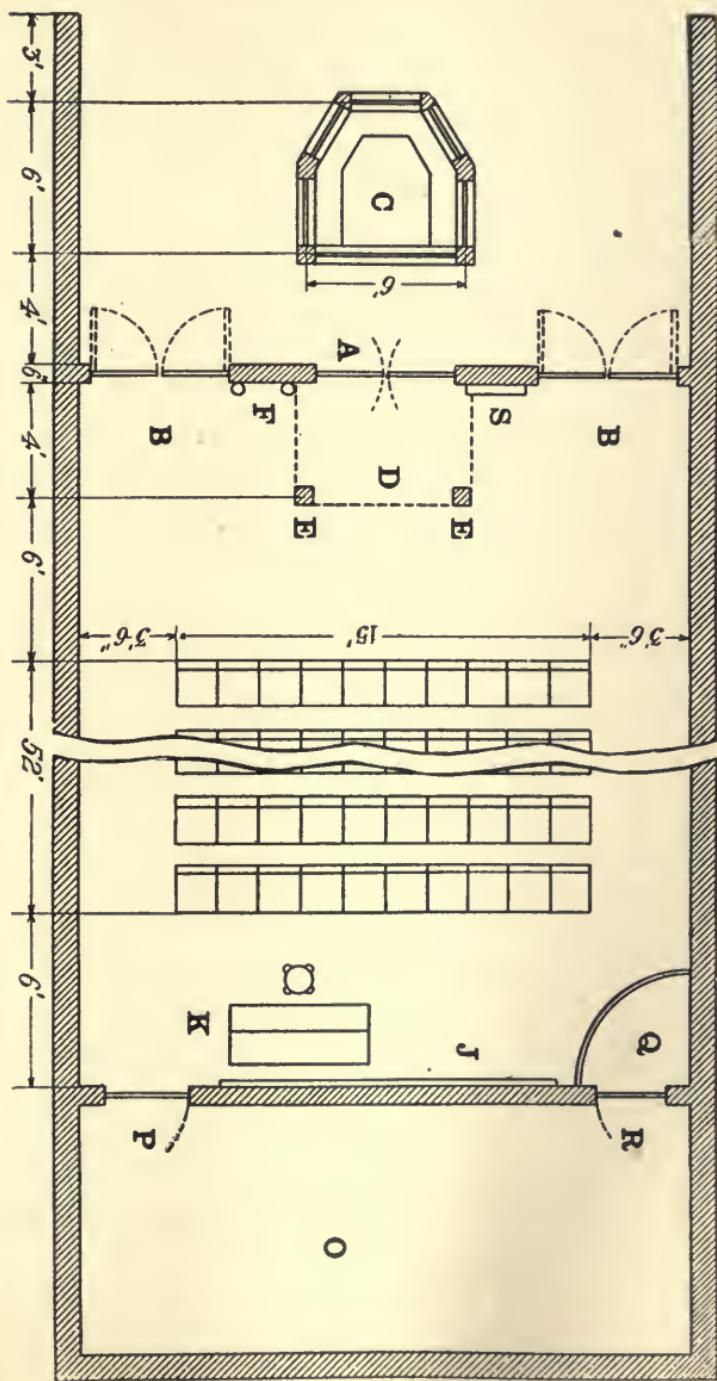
Type of Floor Plan for Theater in Small Store Room.
